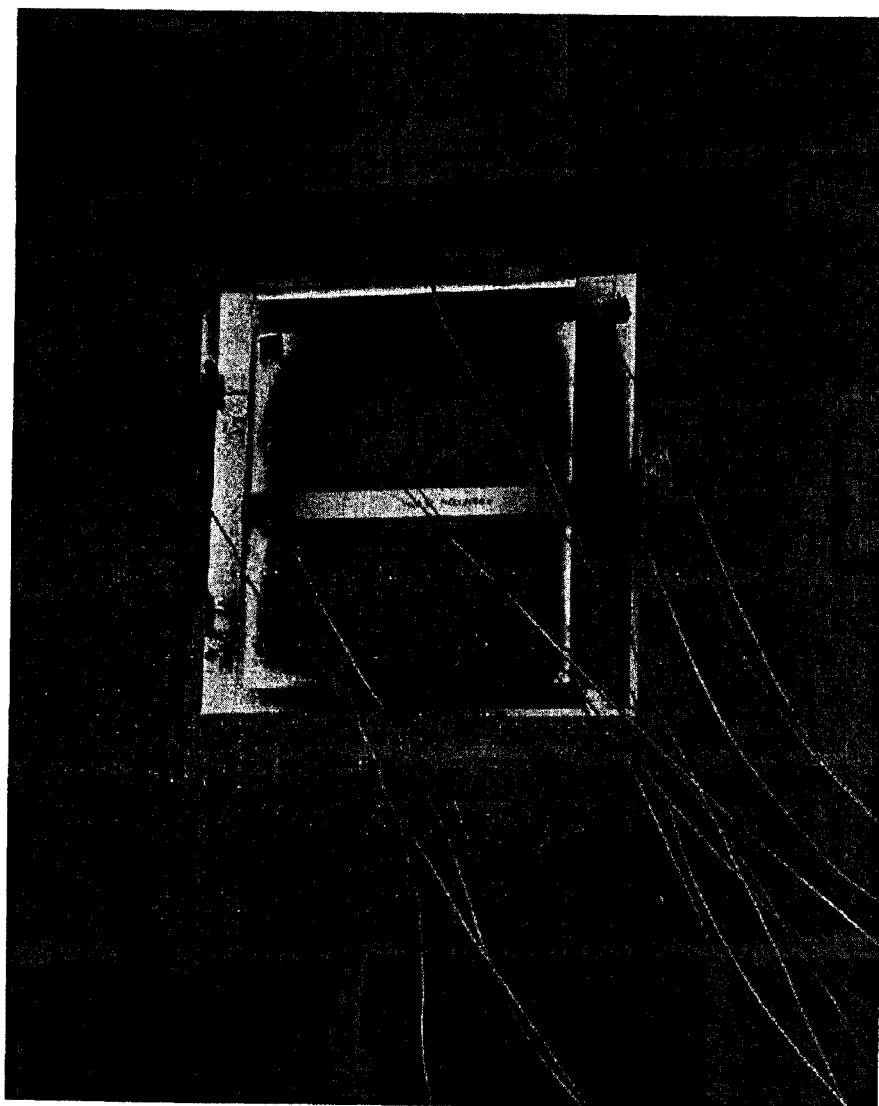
Unexposed face of access panels A at termination of test (90 minutes).
